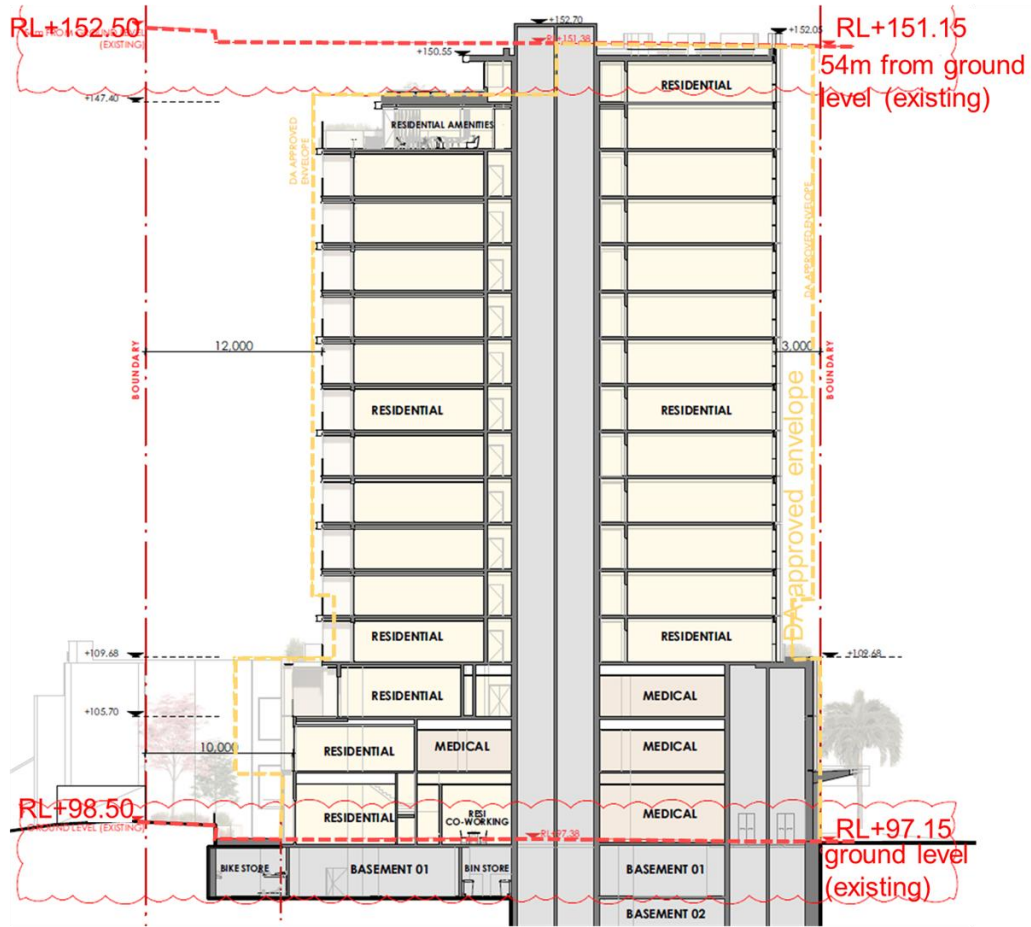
East/west section plan (Source: Fitzpatrick Partners)
